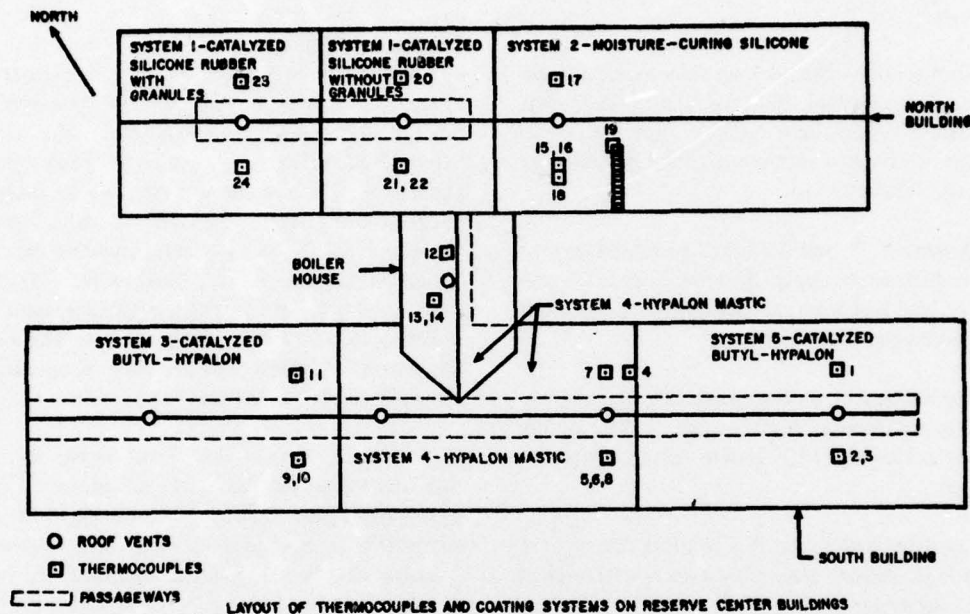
Layout of thermocoupler and coating system on Naval Reserve Center buildings.
